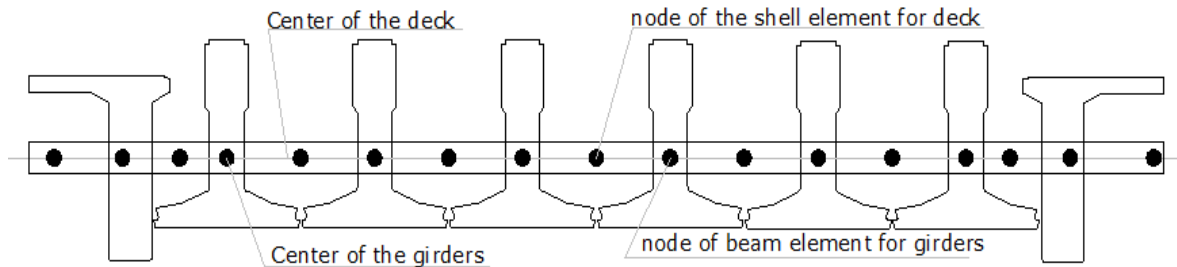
1, Model of centric beam element for the girders and plate elements for the deck
